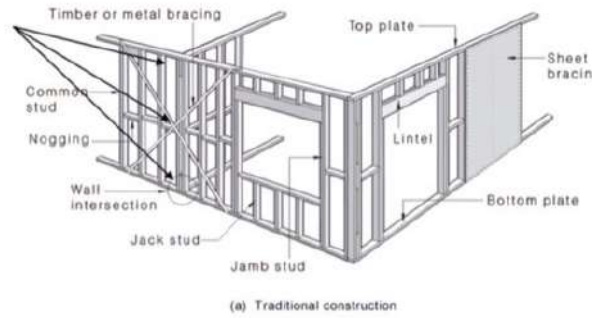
TYPICAL WALL JUNCTIONS
